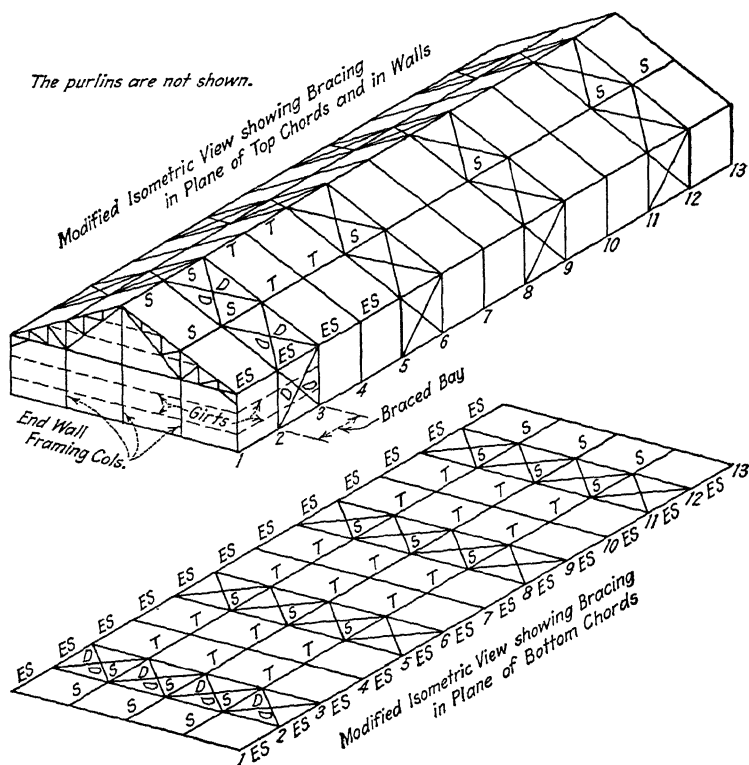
Bracing for Building with Knee-Braced Bents.
